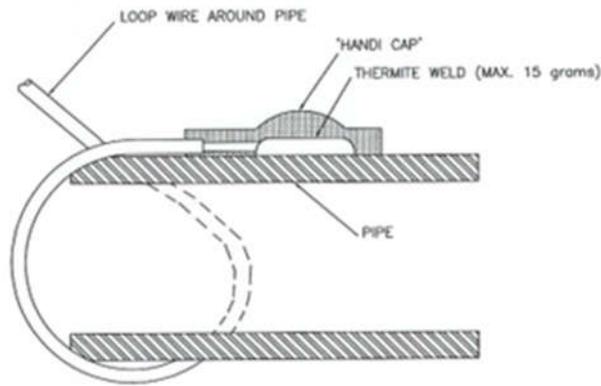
Example of a Exothermic Weld Connection
